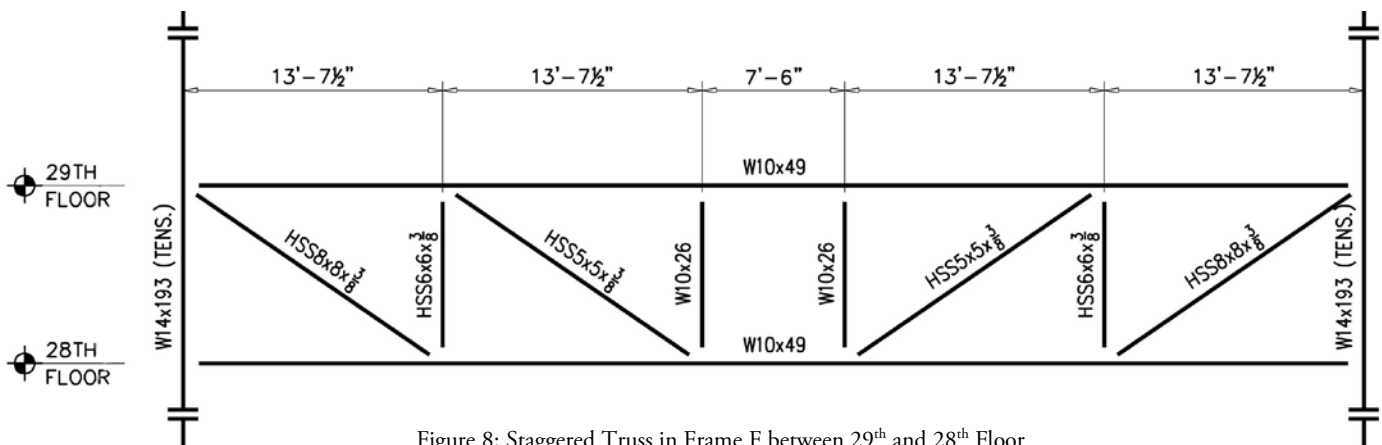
Staggered Truss in Frame F between 29<sup>th</sup> and 28<sup>th</sup> Floor
